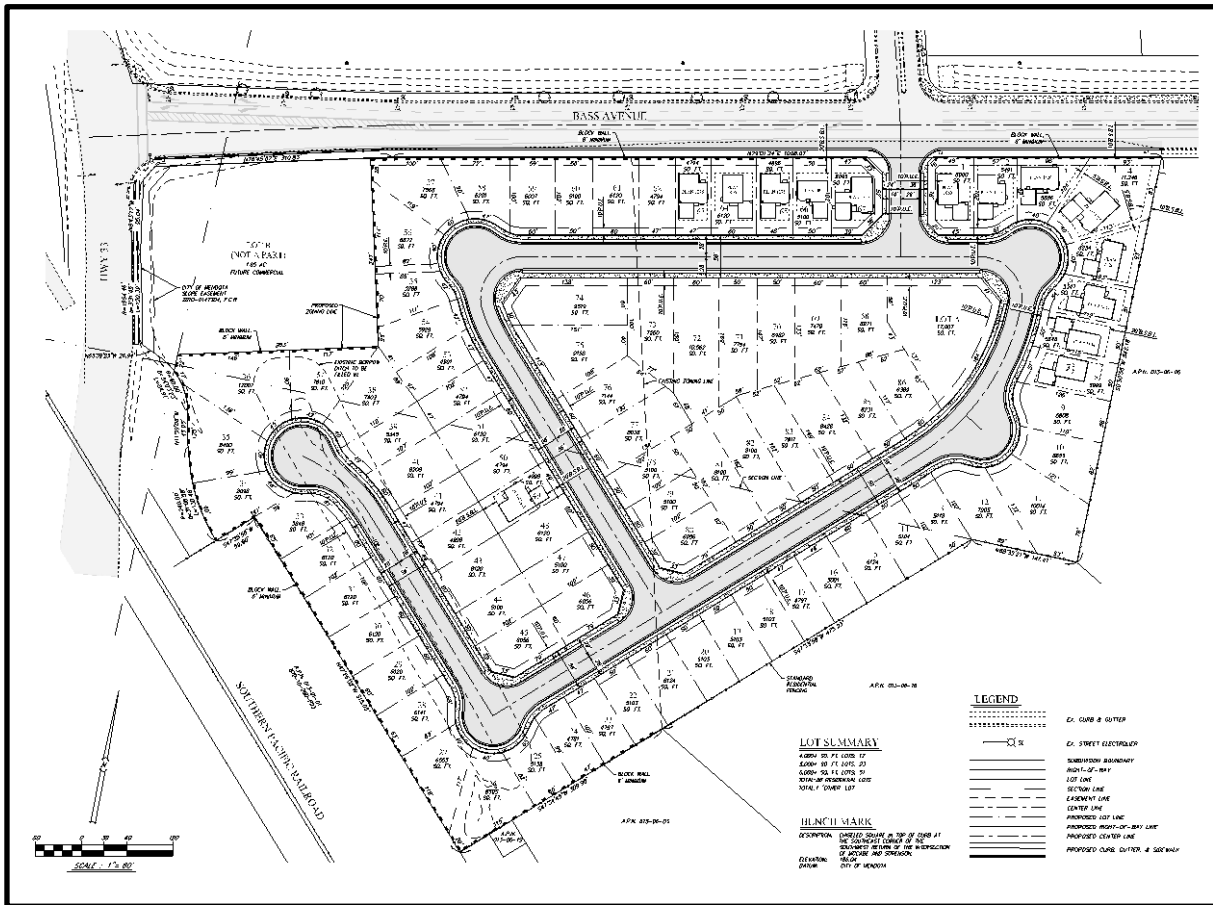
shows the proposed subdivision design. As noted previously, the subdivision proposes 86 single family residential lots, a site for future commercial development (at the southeast corner of Bass and Highway 33) and a small park within the subdivision.
